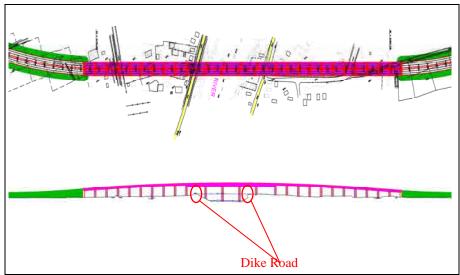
Conceptual General View of the Bridge on Pursat Bypass and Dike Roads
